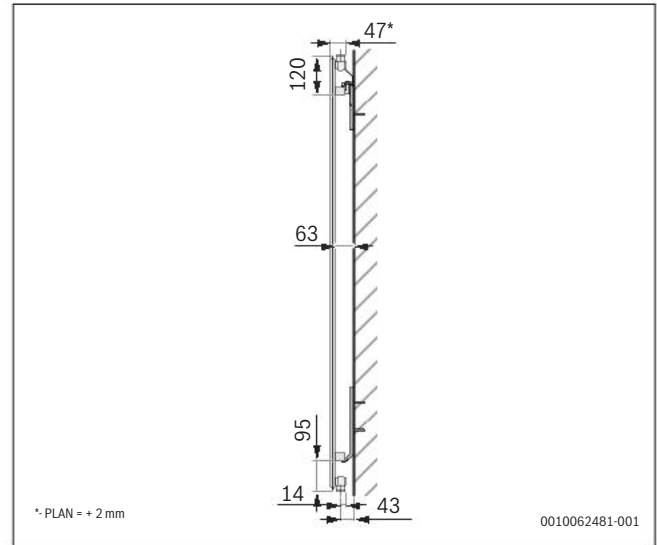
Installing radiators types 10 for CV Profil/ Plan.2
